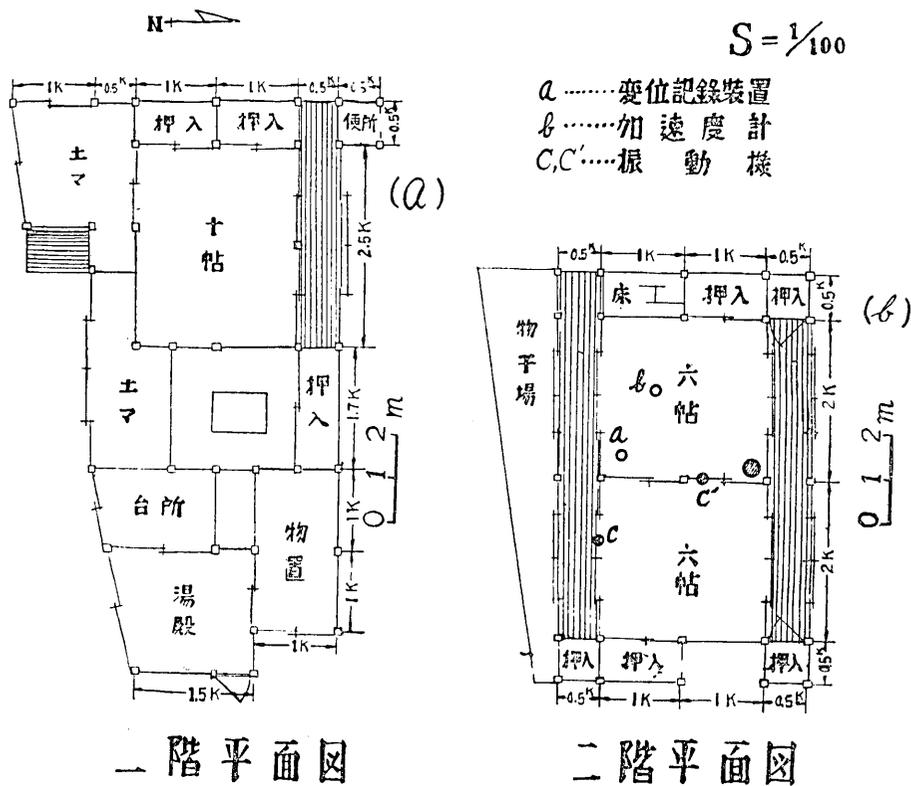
Plan views of two-storied wooden house at 1st and 2nd floors.
